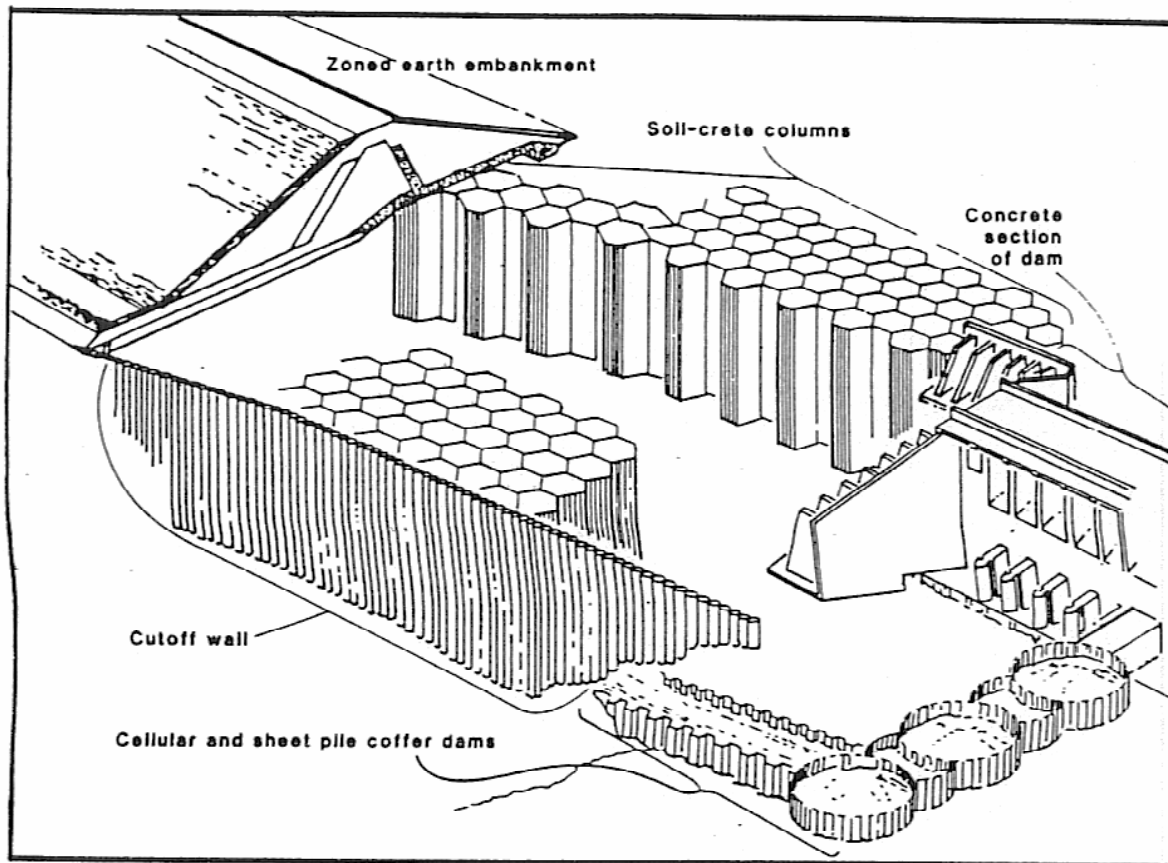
Cut-off wall, and hexagonal containment grid, Jackson Lake Dam (89).
